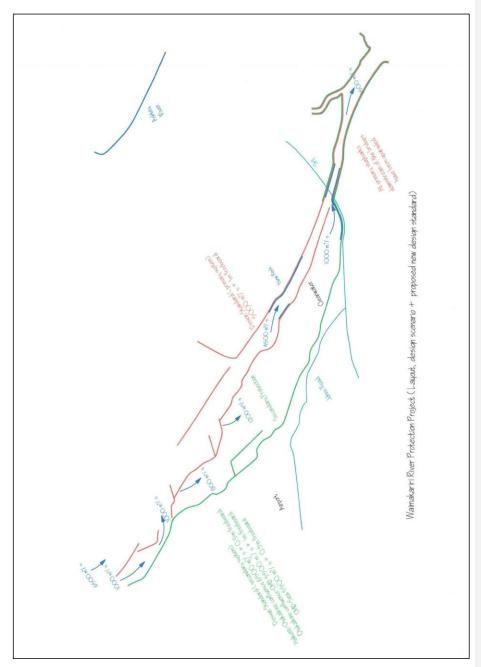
Waimakariri Flood Protection Project - layout, design scenario and proposed new design standard)
